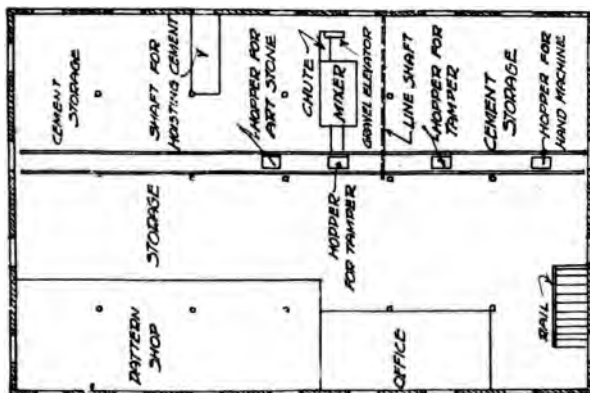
SECOND FLOOR PLAN, PLANT NO. 6
